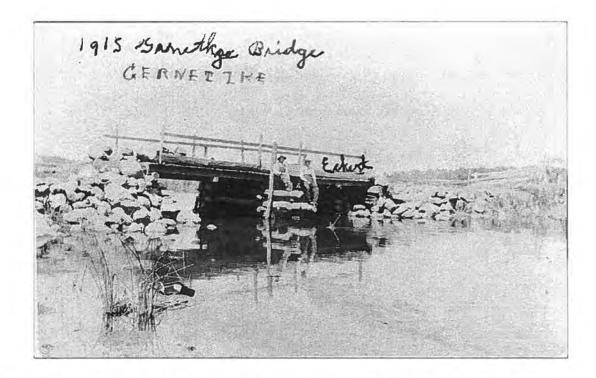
The Gernetkge Bridge was a typical utilitarian structure of the nineteenth century. (Source: Collection of Robert Newbery).
